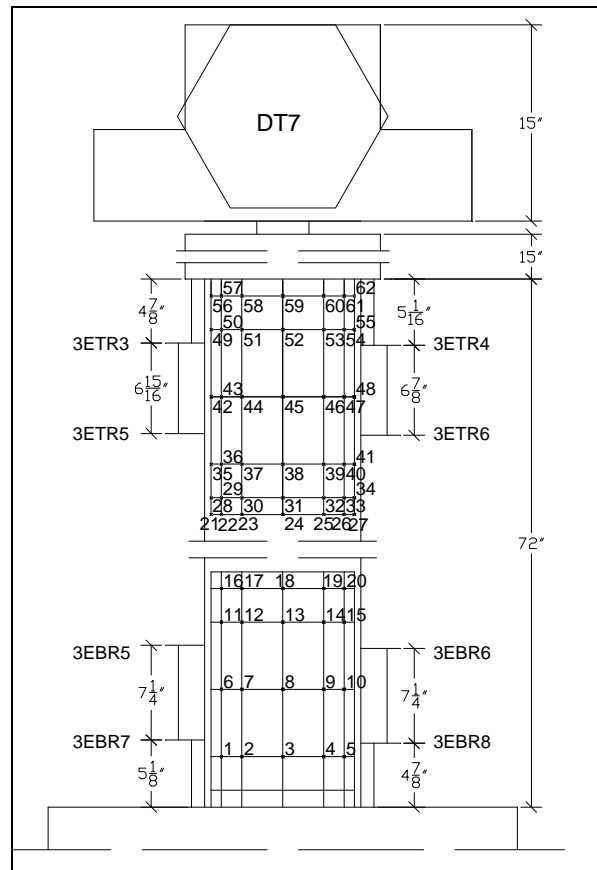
Grid system and LVDT locations on column in the Bent 3 east column
